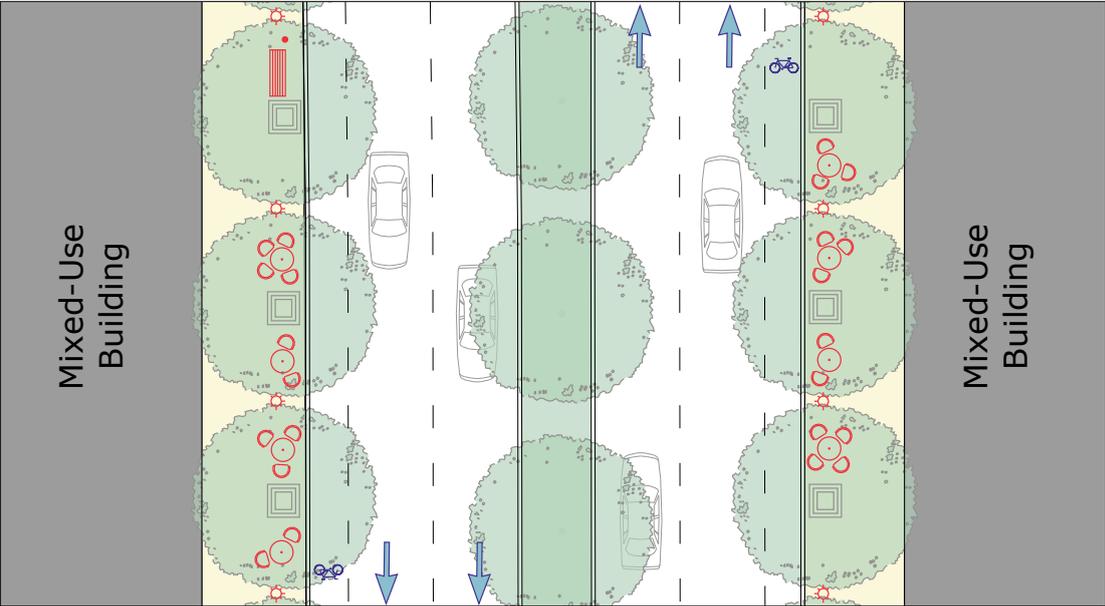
Proposed University Avenue east of I-215/SR-60
